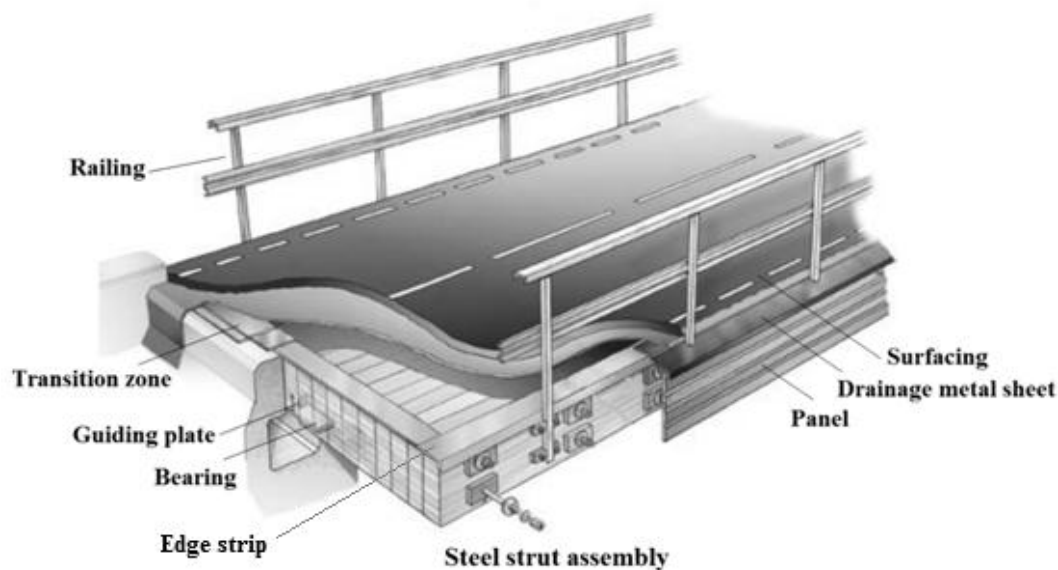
Example of a transversally prestressed glulam timber slab and the connection to the freestanding abutment, Martinson (2011b)
